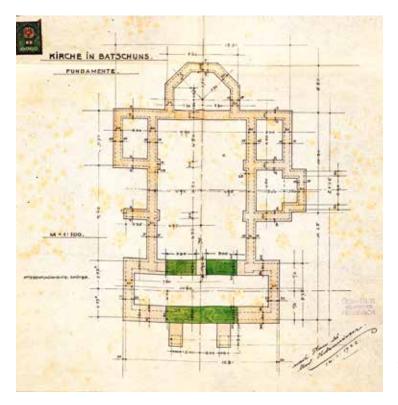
St John the Baptist Church, Batschuns, original ground plan (Vorarlberger Landes-Archiv. BH Feldkirch, XIV 40-1631/1923 — Bauakt Kirche Batschuns)
